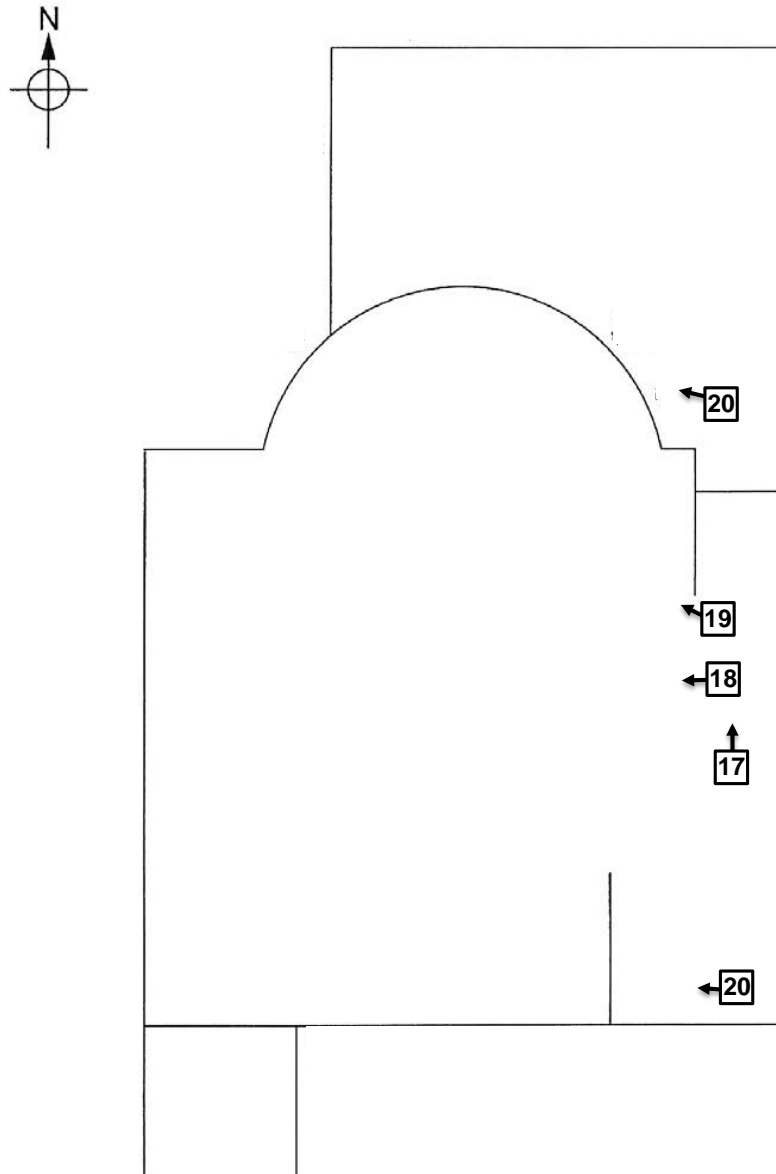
Second Floor Plan and Photo Key 3 (Photos 16-20)
